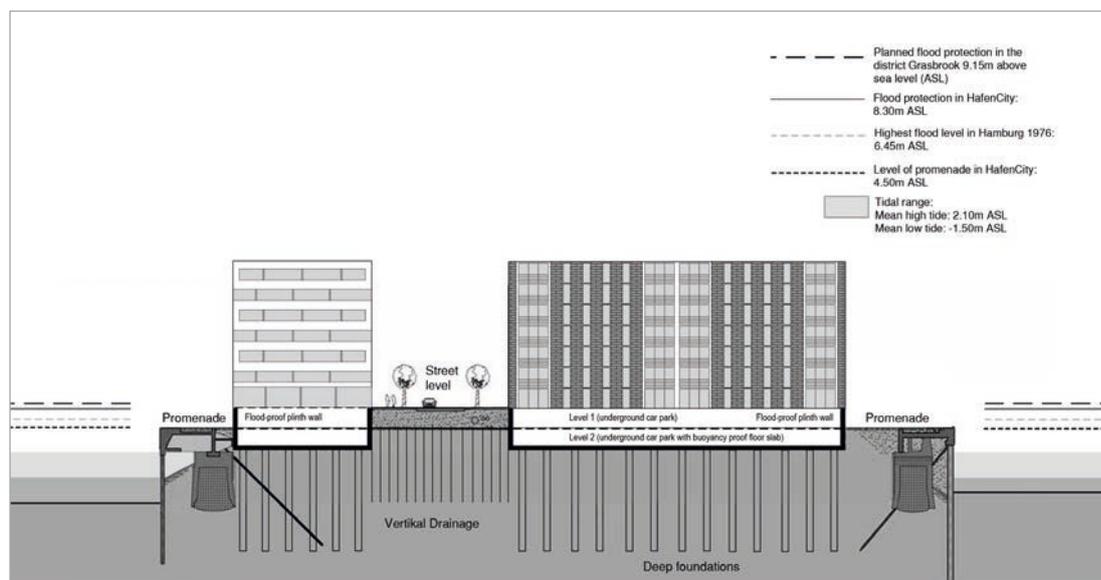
| Typical cross-section – Flood protection concept (Waftkonzept)
